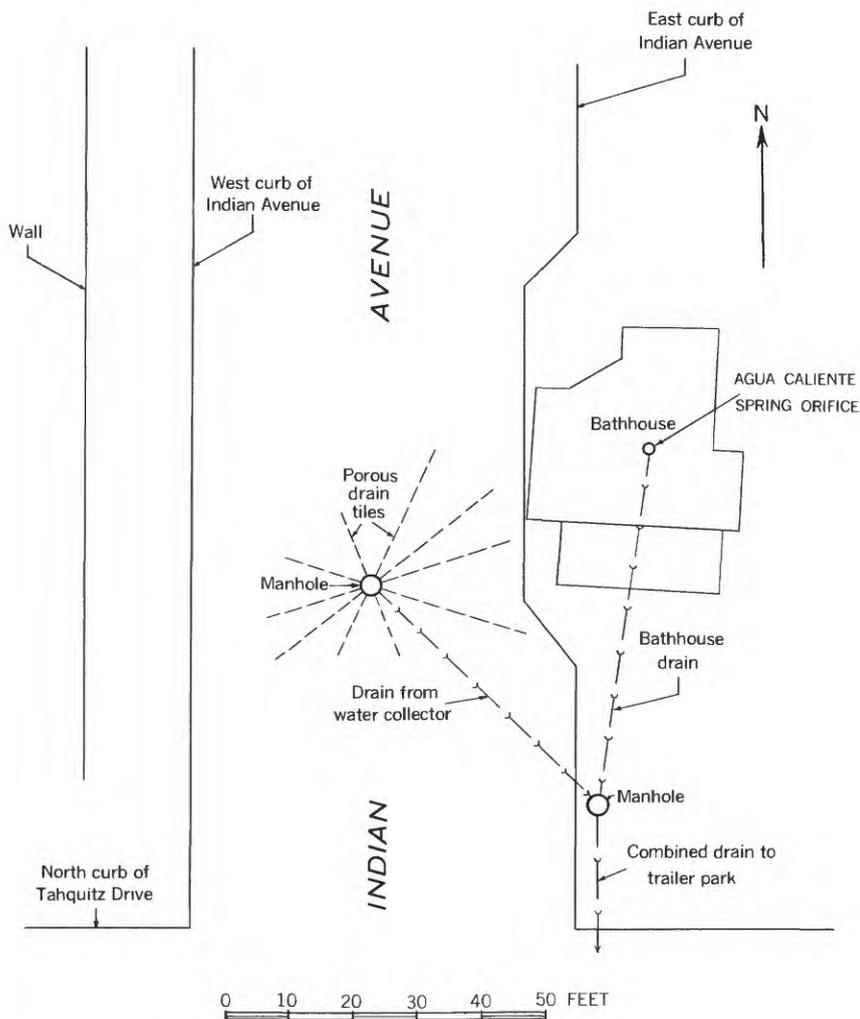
Site plan of Agua Caliente Spring after road construction.
